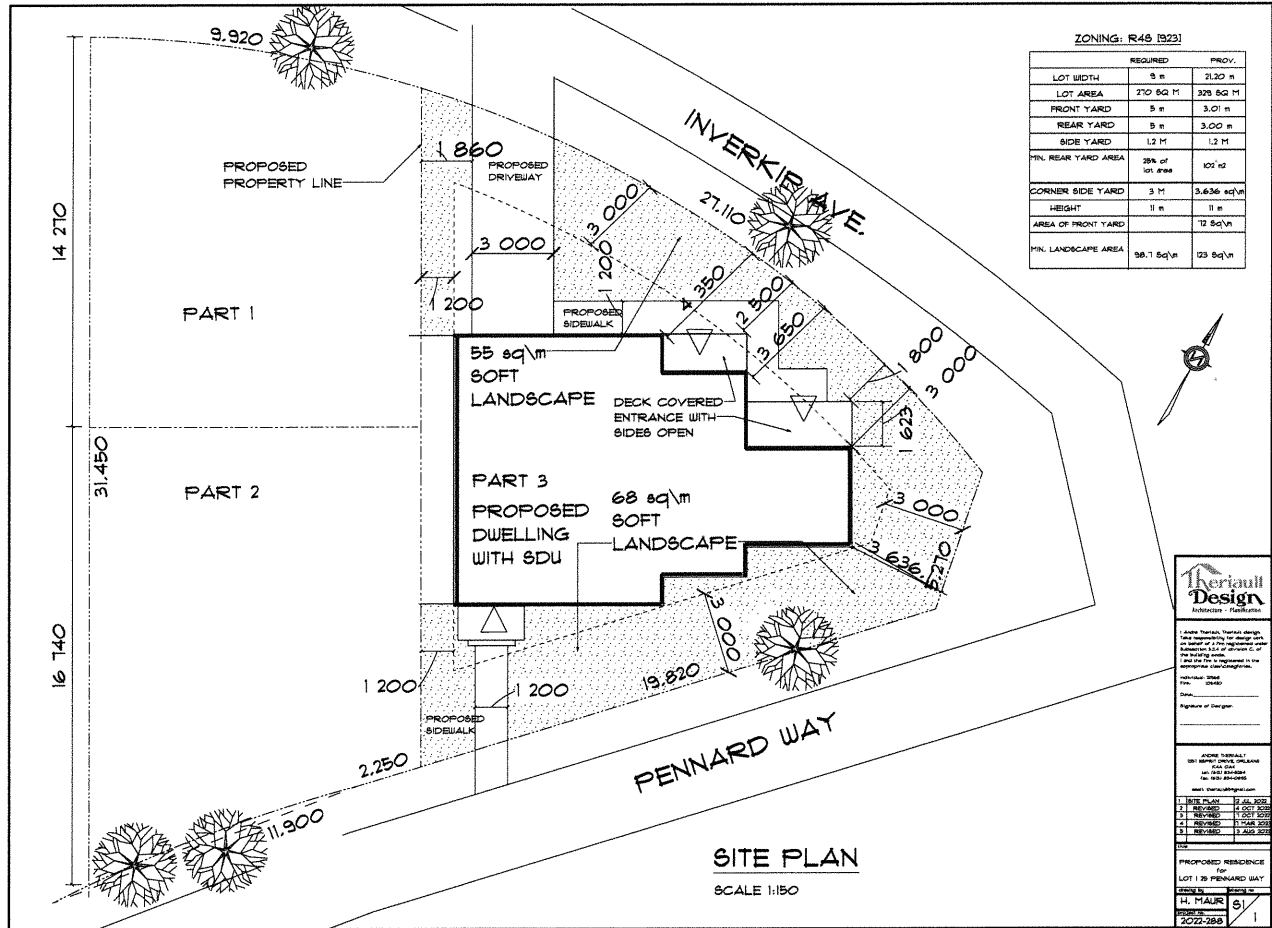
Site Plan Single Detached Dwelling (Source: Therriault Design)
